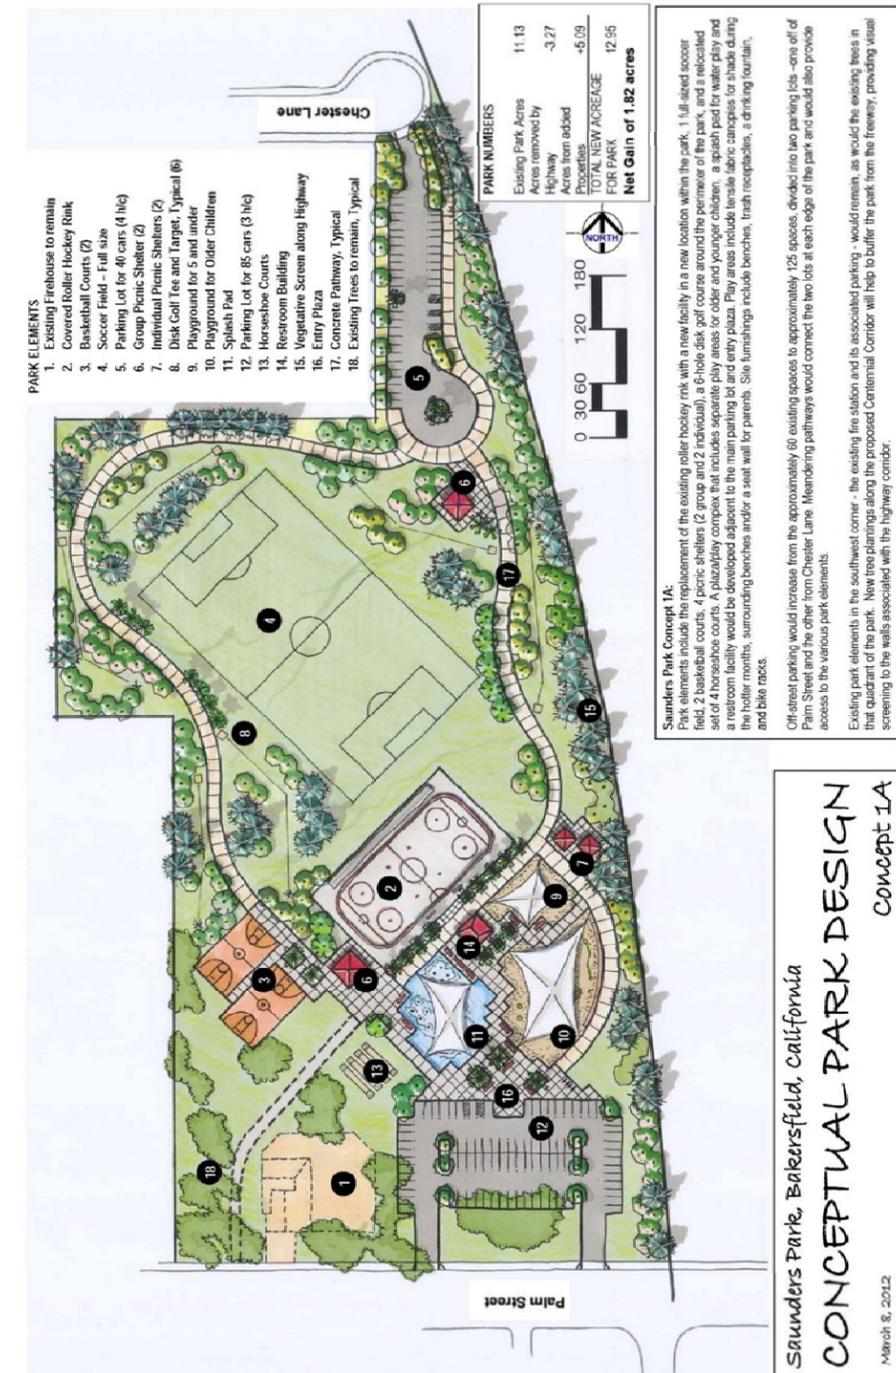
Concept Design Drawing of Saunders Park Rearrangement under Alternative C
